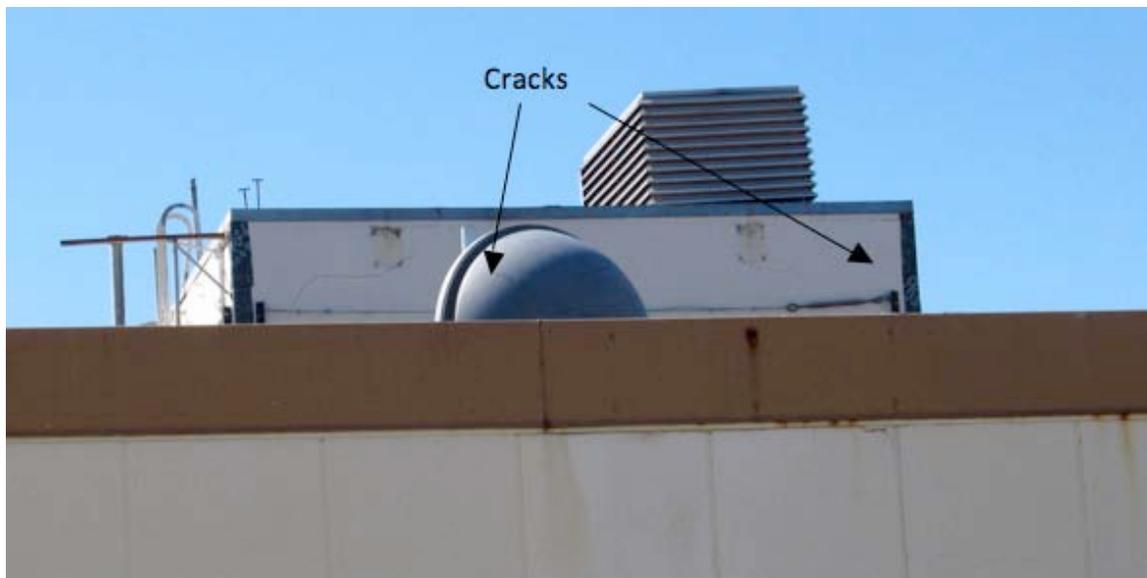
Additional cracks in the wall opposite to the one that fell
